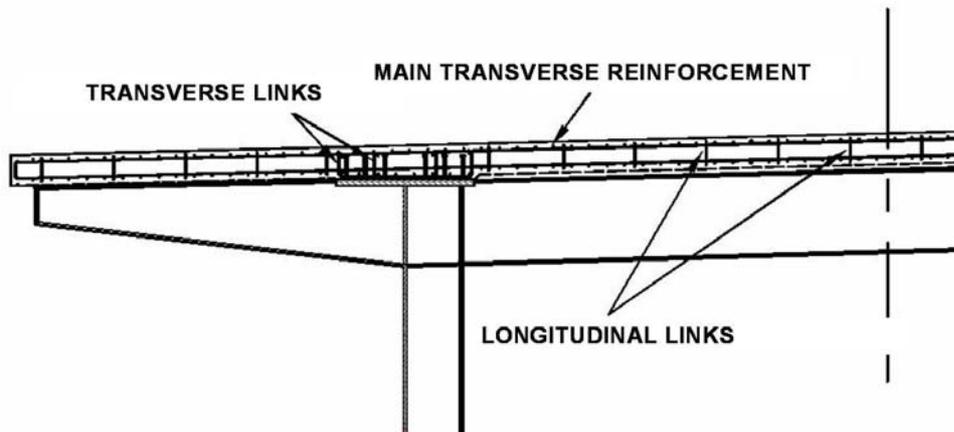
Standard slab reinforcement principle for a deck with directly supporting cross-beam (excluding restraint system anchorage)
